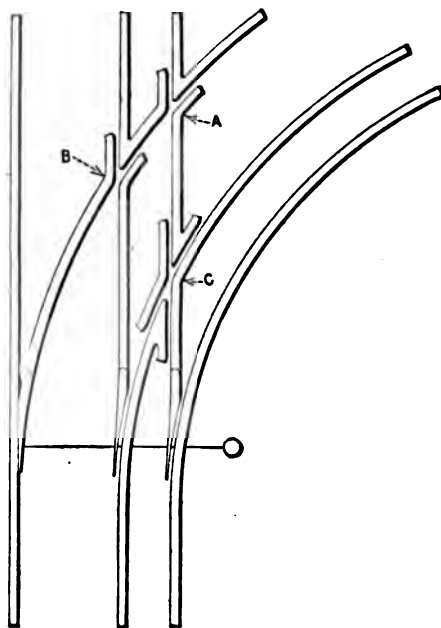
DOUBLE-GAGE TURNOUT USED ON MINE TRACKS.
